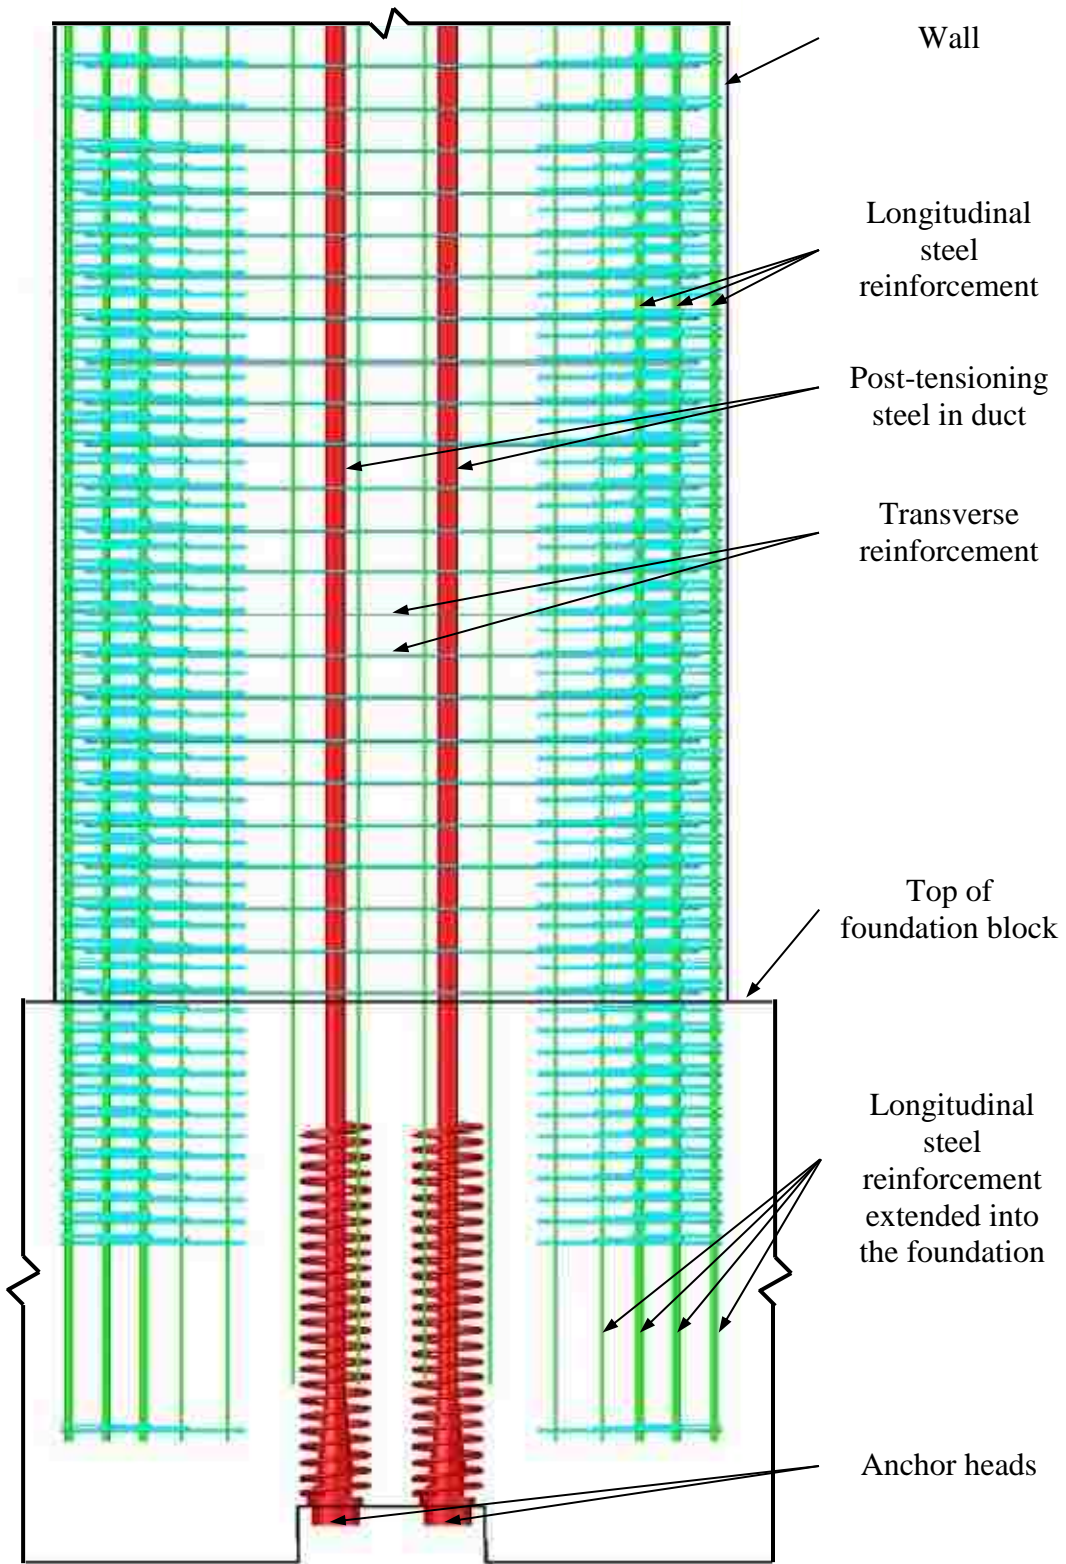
Typical structural elements in an unbonded PT structural wall
